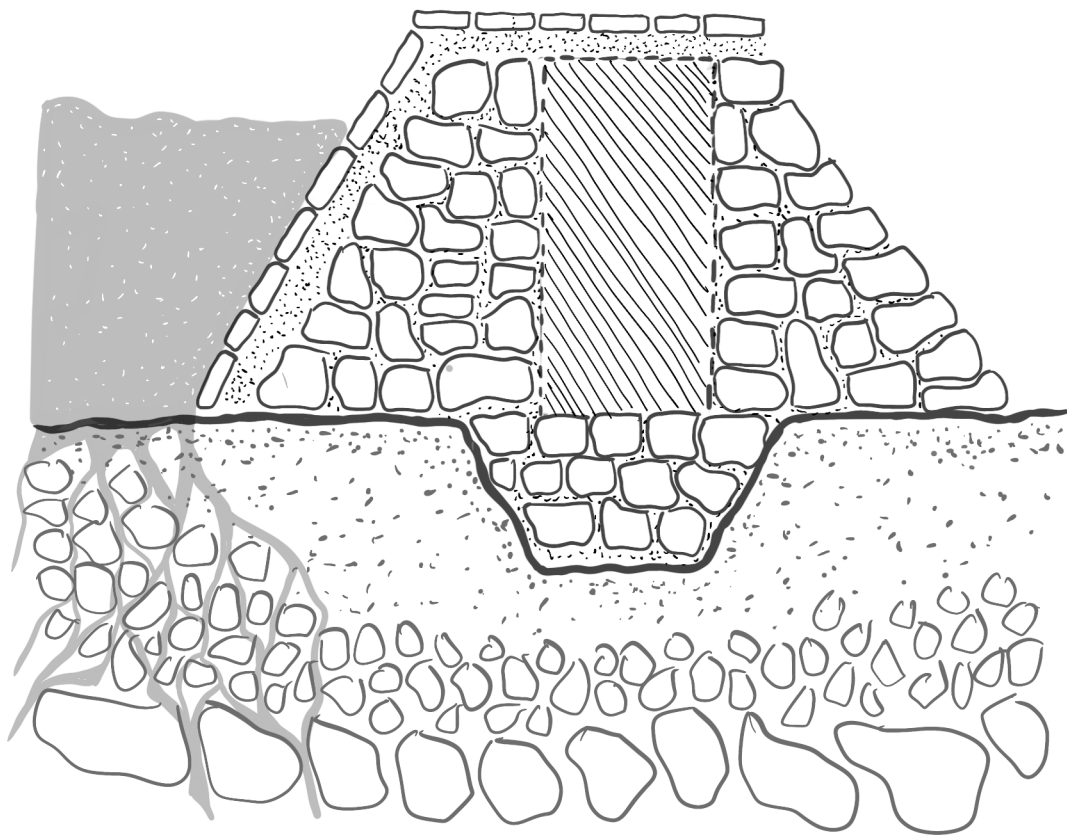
Cochas' Clay and Rock Containment wall Dam's Waterproof Concrete Containment wall
